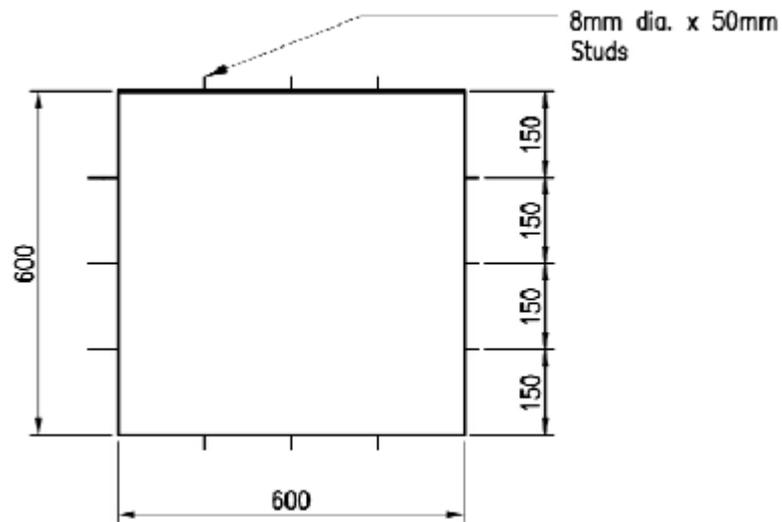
Typical Slab Used in the Design for Modular Ferrocement Slab Element
